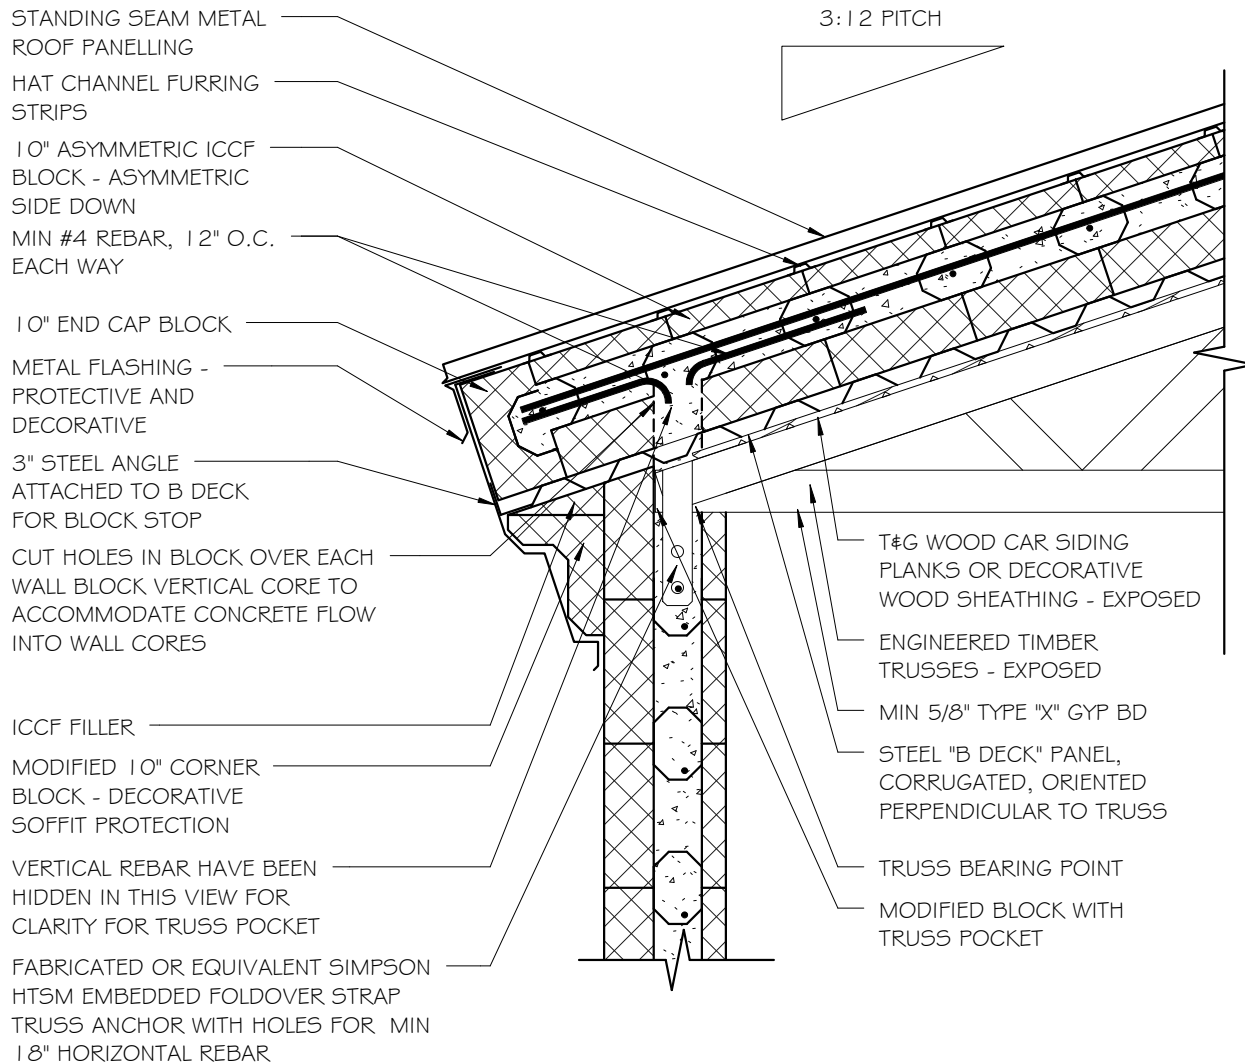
DETAIL FOR ICCF ROOF - CONCRETE SLAB ON
